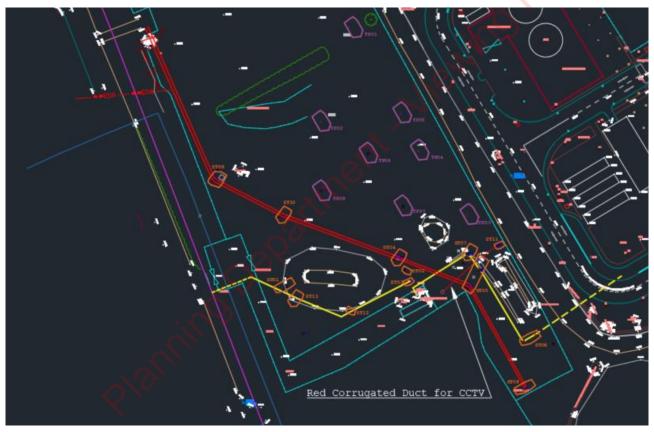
Site :Layout showing Cofirmed Service Locations and Site Investigation Excavations
